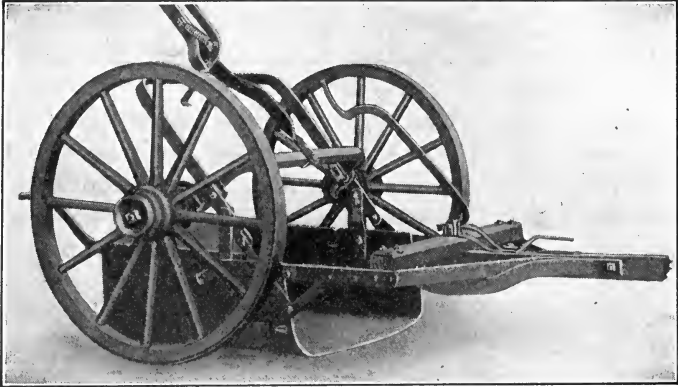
Wheel scraper, ready to load. (*Courtesy of Western Wheeled Scraper Co.*)
